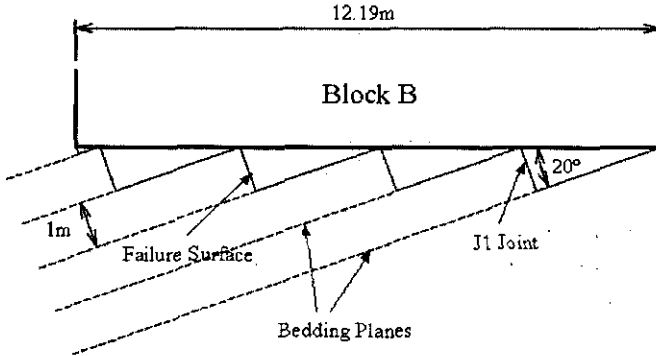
Typical Representation of Sliding Failure Surface Considered Under a Dam Block
